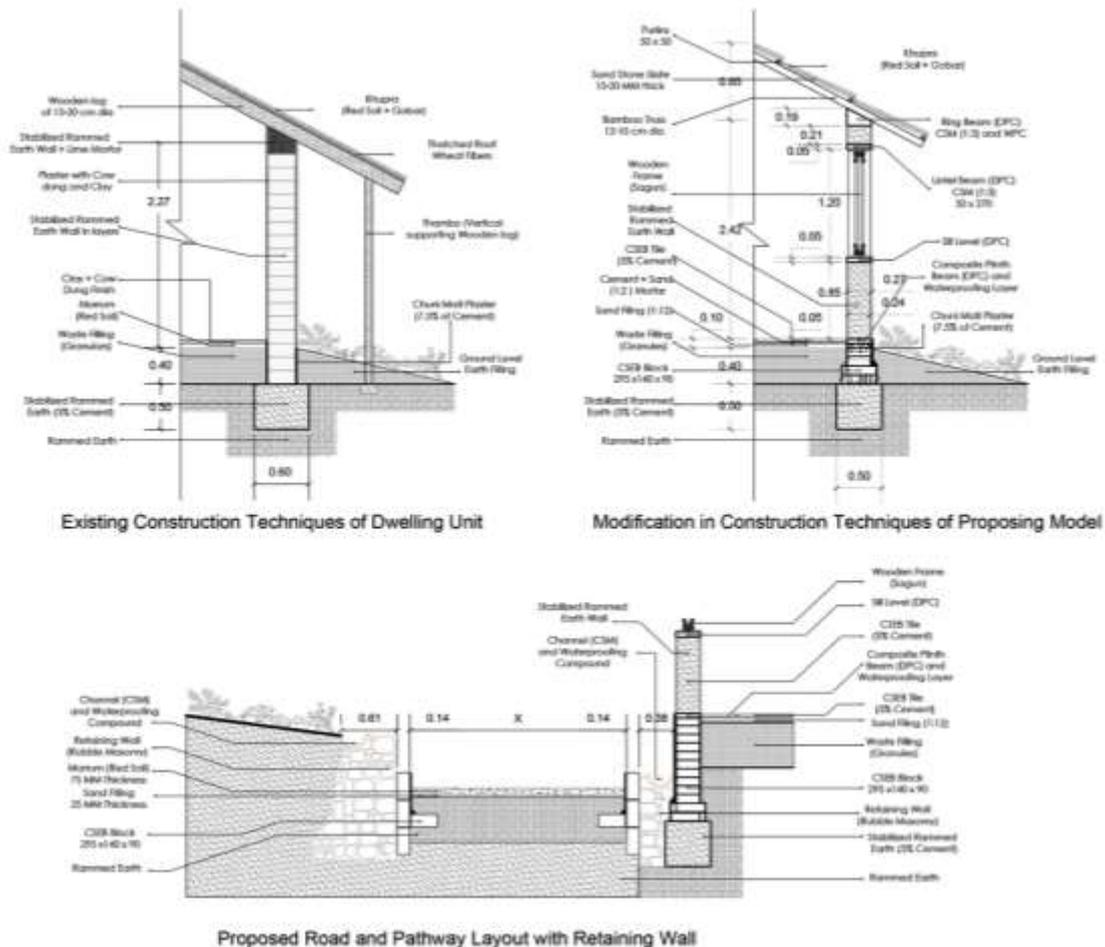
Construction Details of Traditional Dwelling Unit & Modification for PDM
